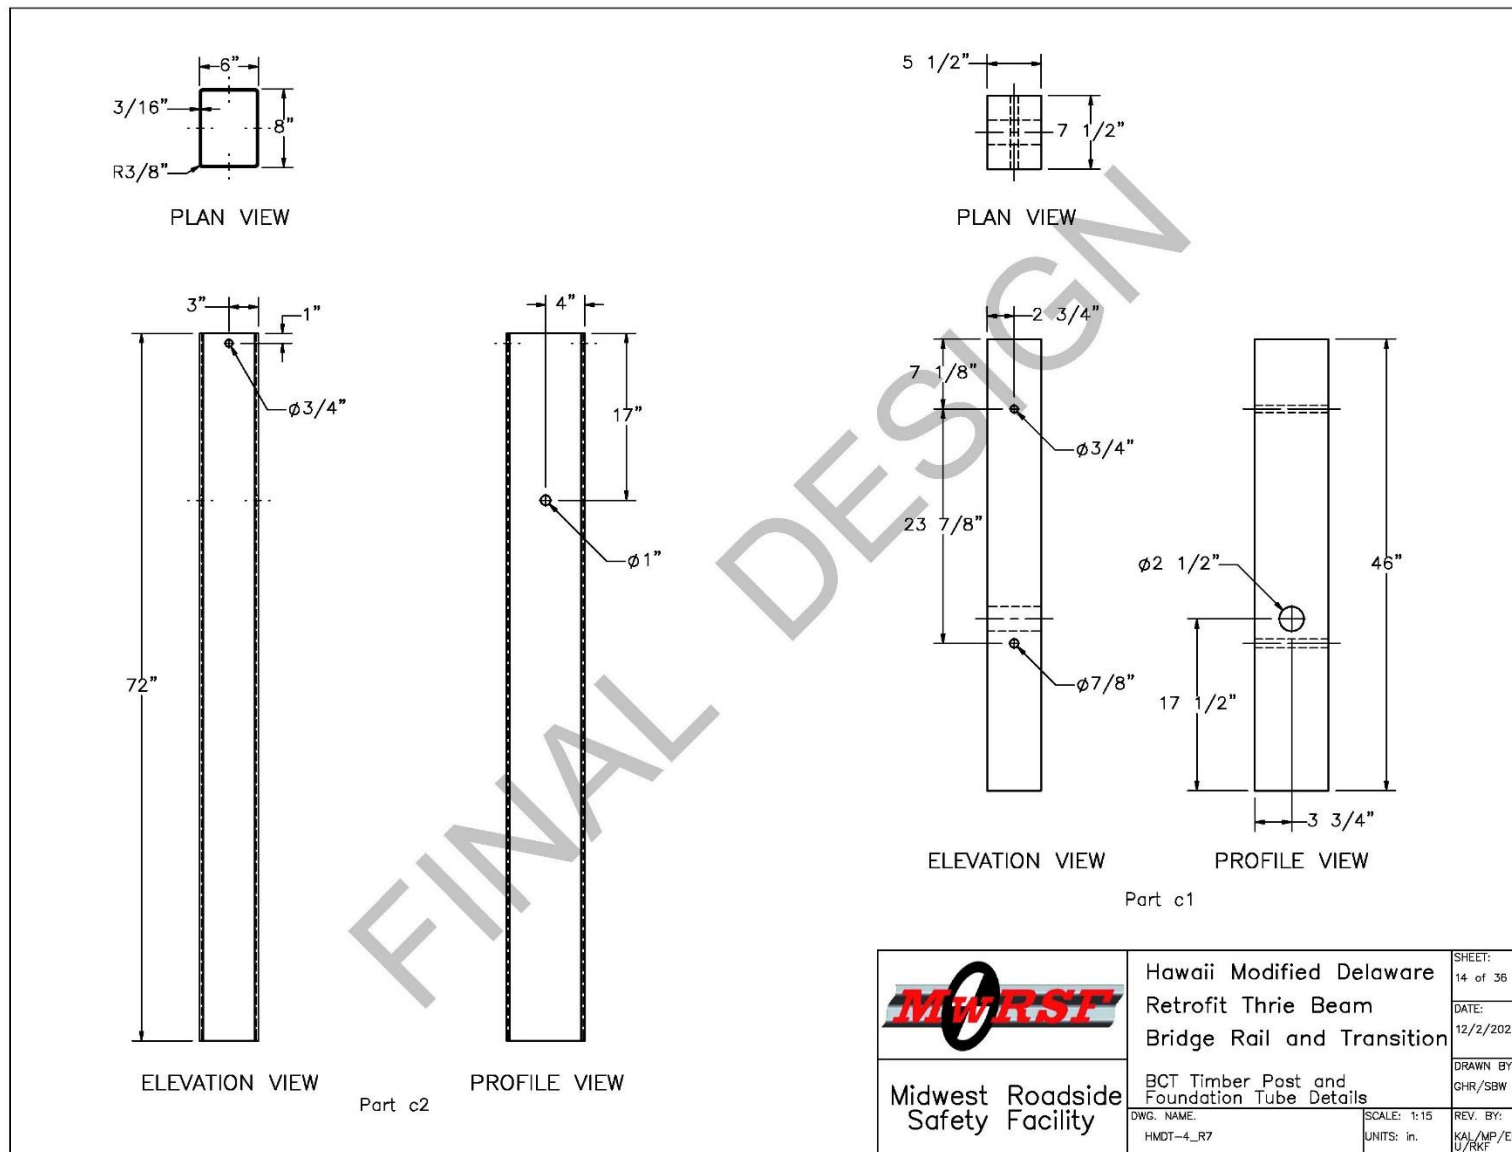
BCT Timber Post and Foundation Tube Details, Test No. HMDT-4
